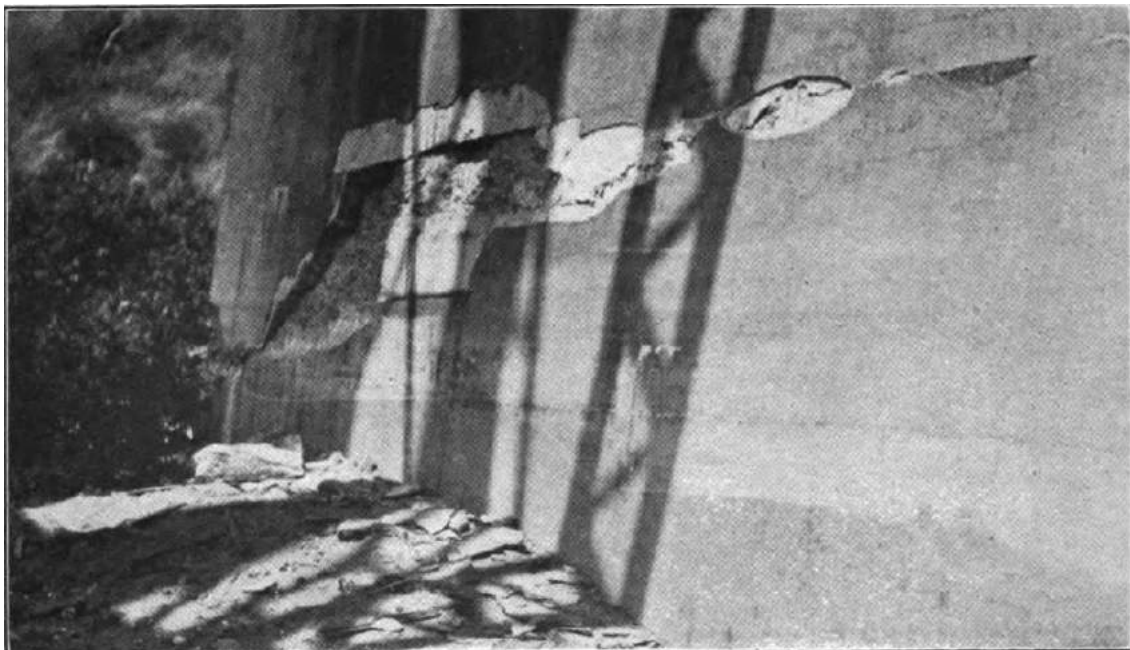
Cracking Damage at the Base of a URC Pier of Pajaro Bridge after the 1906 San Francisco Earthquake (Duryea and ASCE 1907)
